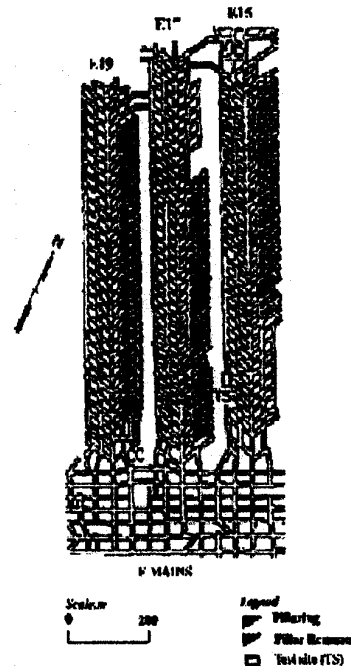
Plan view of panels E15, E17 and E19 showing location of test site
